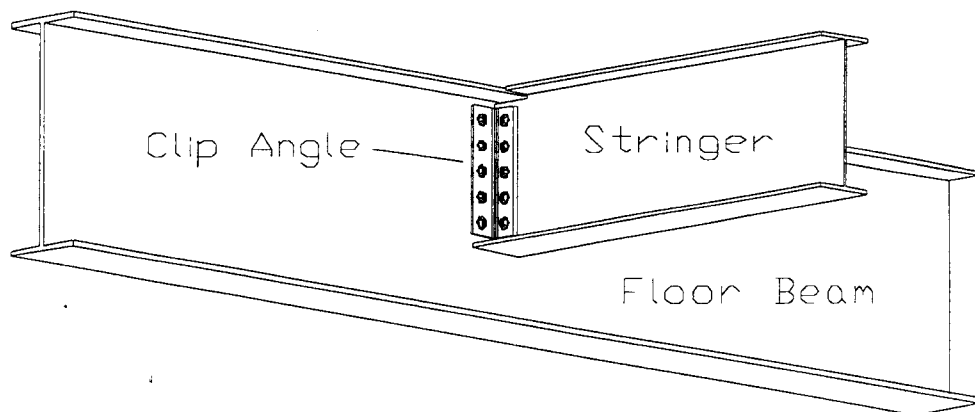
Typical stringer to floor beam connection detail assembly.
